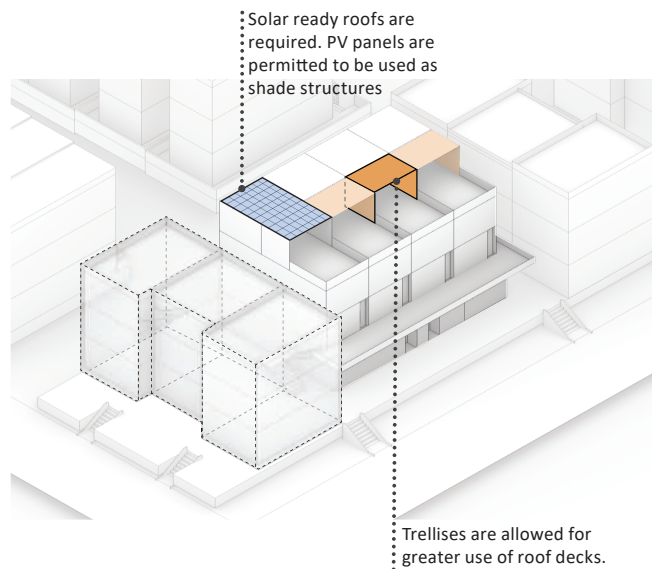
ROOF DECKS AND TRELLISES/SHADE STRUCTURES
